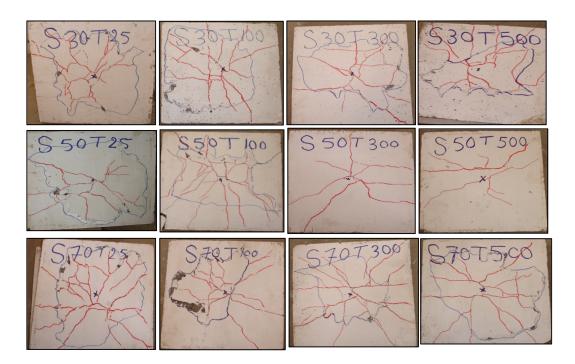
Crack Patterns of Tested Specimens at Failure (bottom face)
